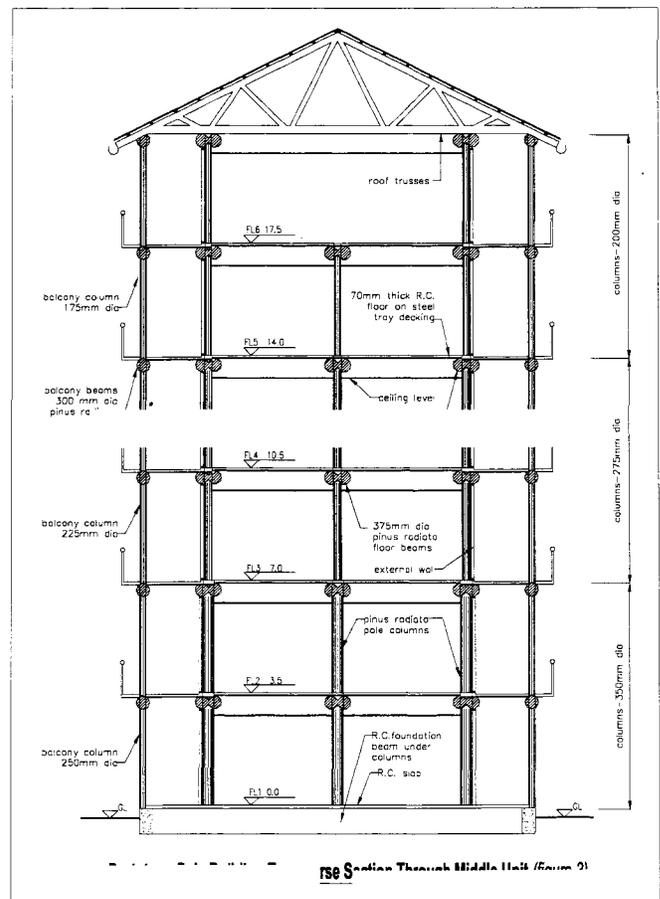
Prototype Pole Building - transverse section through middle unit.
